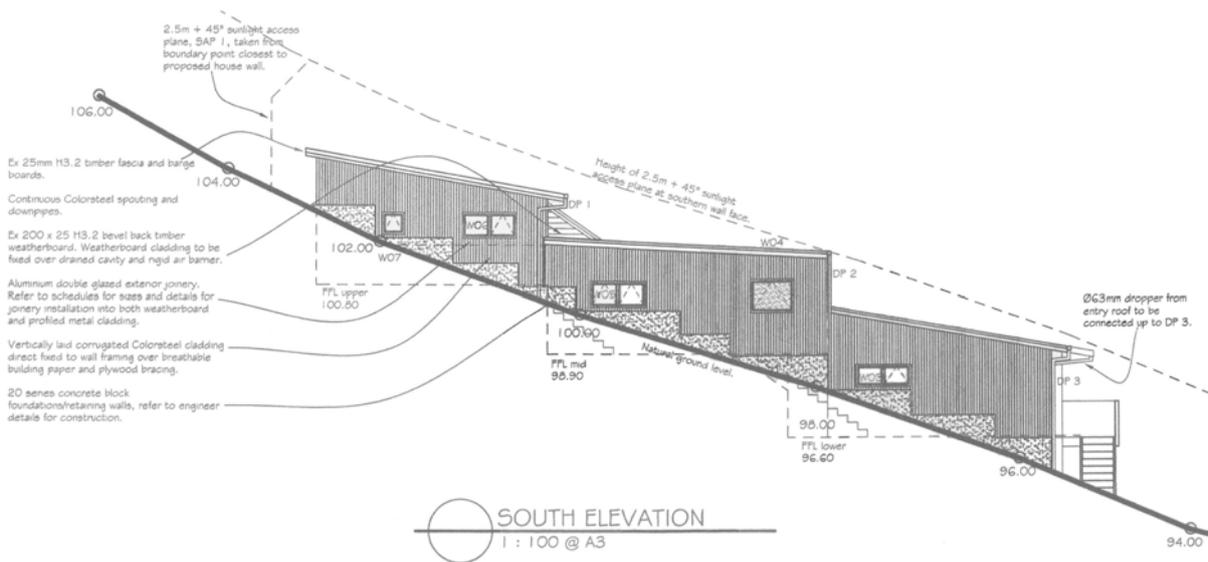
PROPOSED HOUSE SOUTH ELEVATION (source:Wallis Architectural Design)
